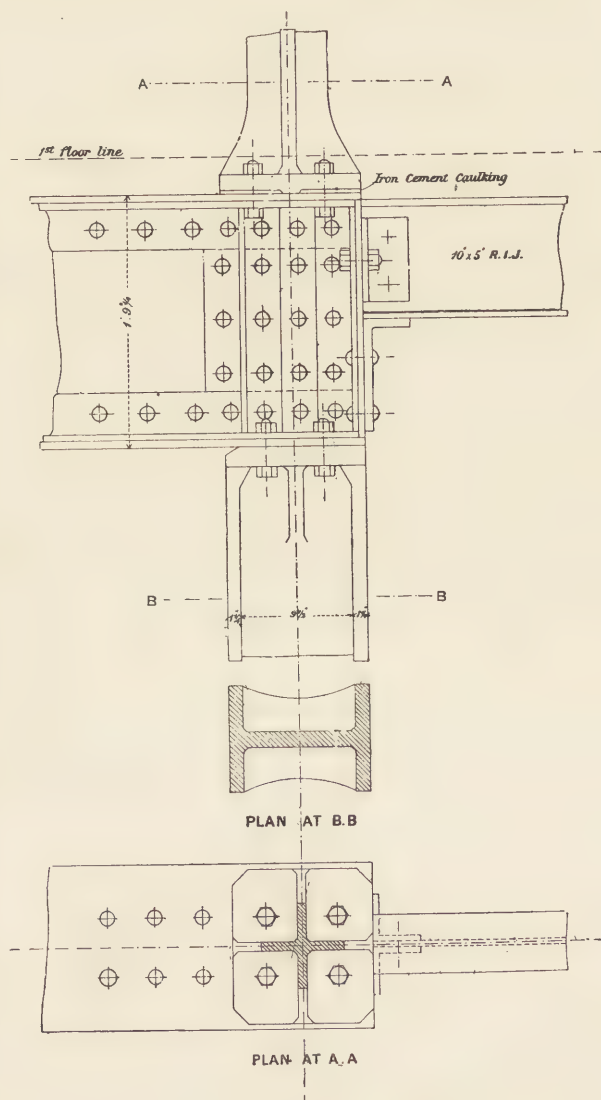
A STANCHEON ON TOP OF GIRDER.
